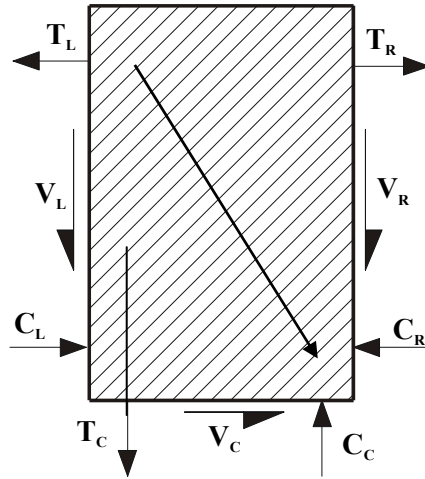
Straining Actions Acting on the West Beam-Column Connection
